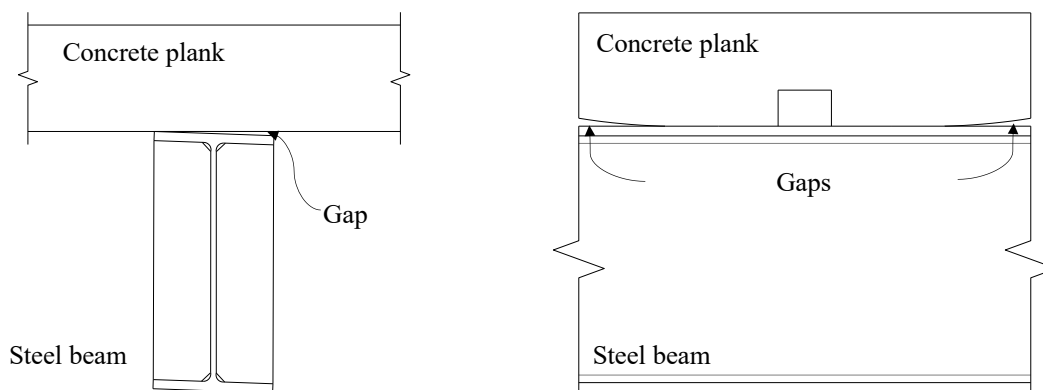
Gaps and contact at steel/concrete interface during beam construction
